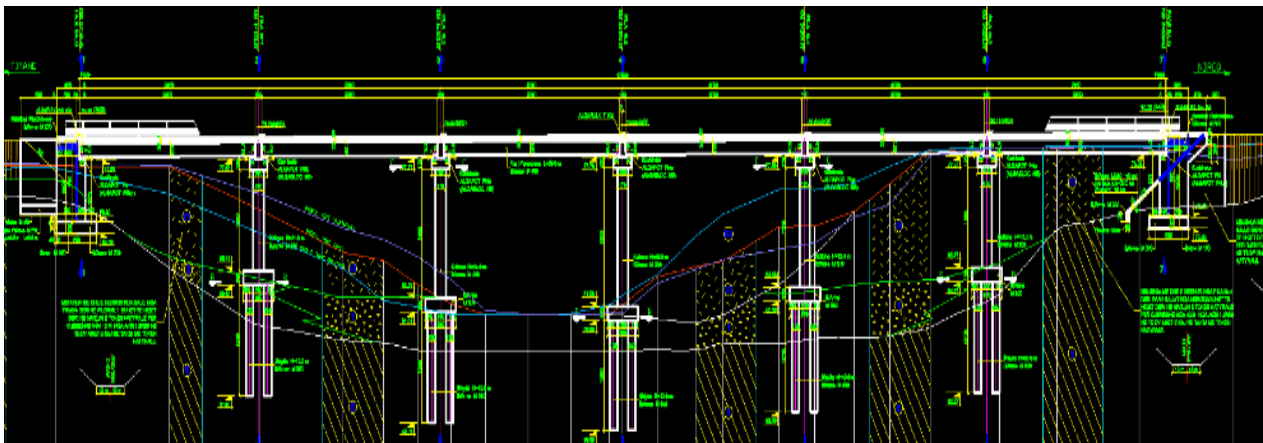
Technical design of New bridge over the Erzeni River at km 3+233.97 – longitudinal cross section
